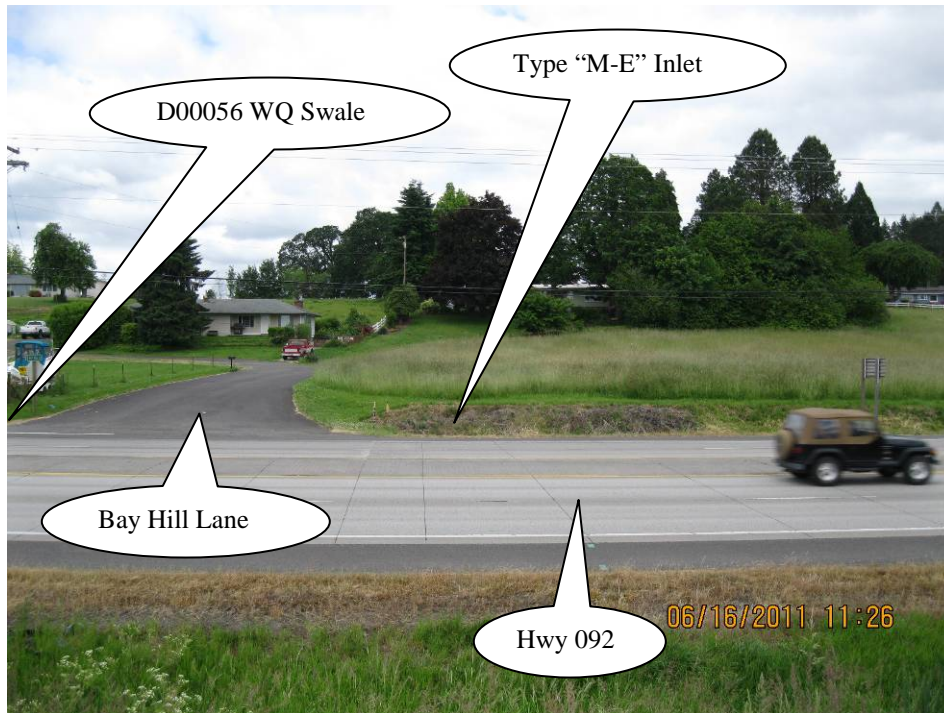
Looking west at the north side of Bay Hill Lane where a Type “M-E” inlet conveys water from swale D00056. Hwy 092 is located straight ahead.
